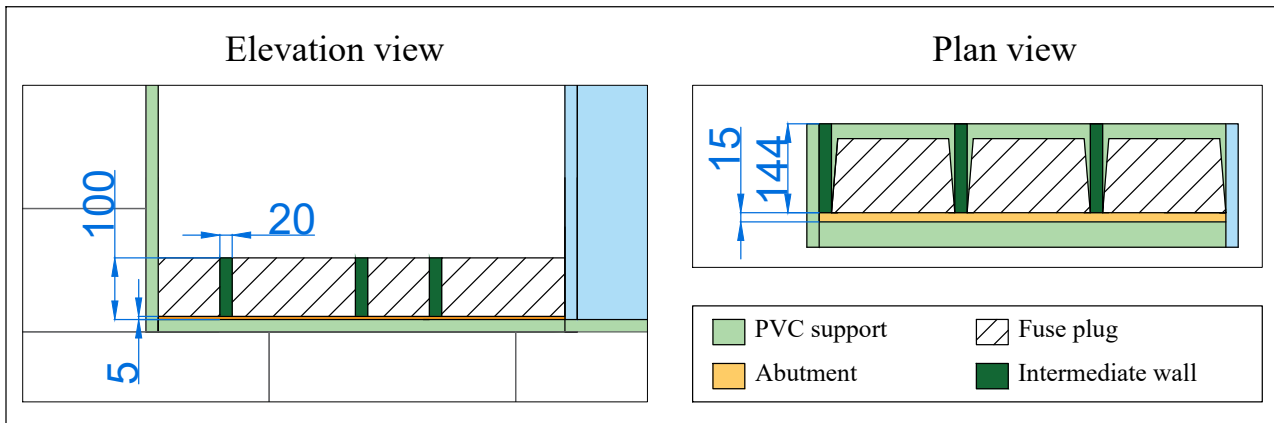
Elevation and plan view of block installation (Dimensions are given in mm)
